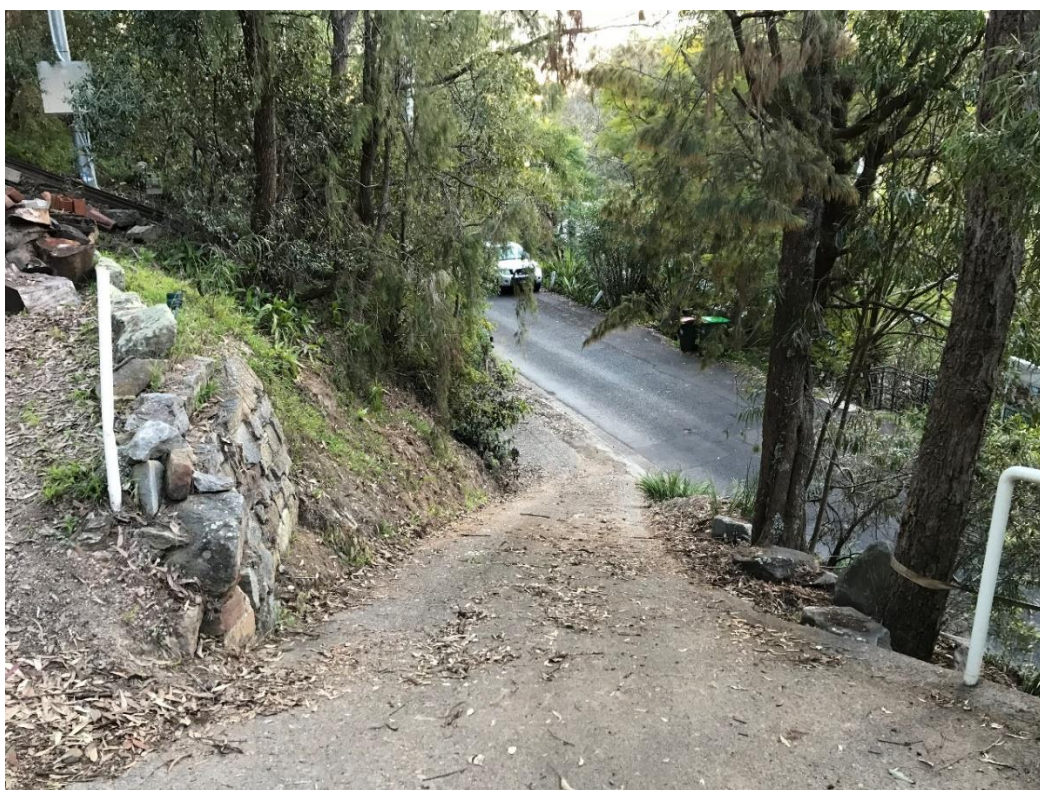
View looking north-west down existing driveway to Herbert Avenue
